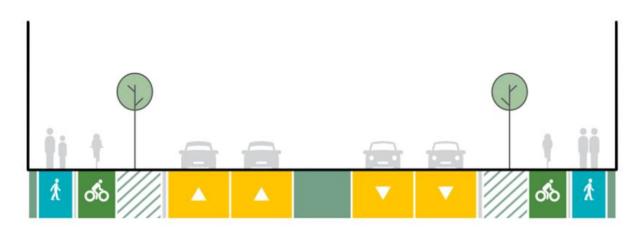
Typical urban cross section 30m – Access Road (north of Wookey Lane
